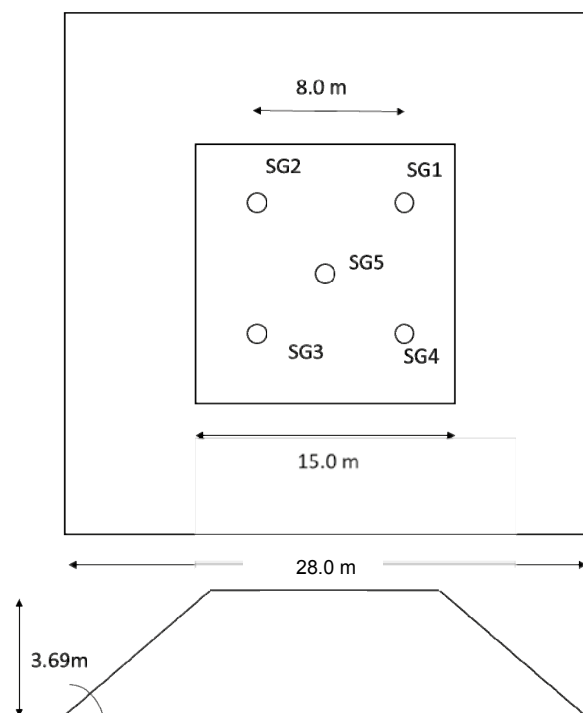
Plan arrangement of the settlement plates and typical cross section.
